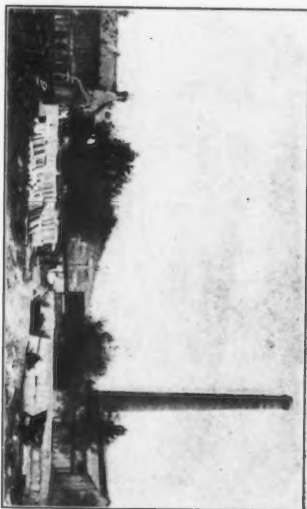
YARD AT WALTHAMSTOW, WITH PILES OF SLABS MADE FROM CLINKER.
